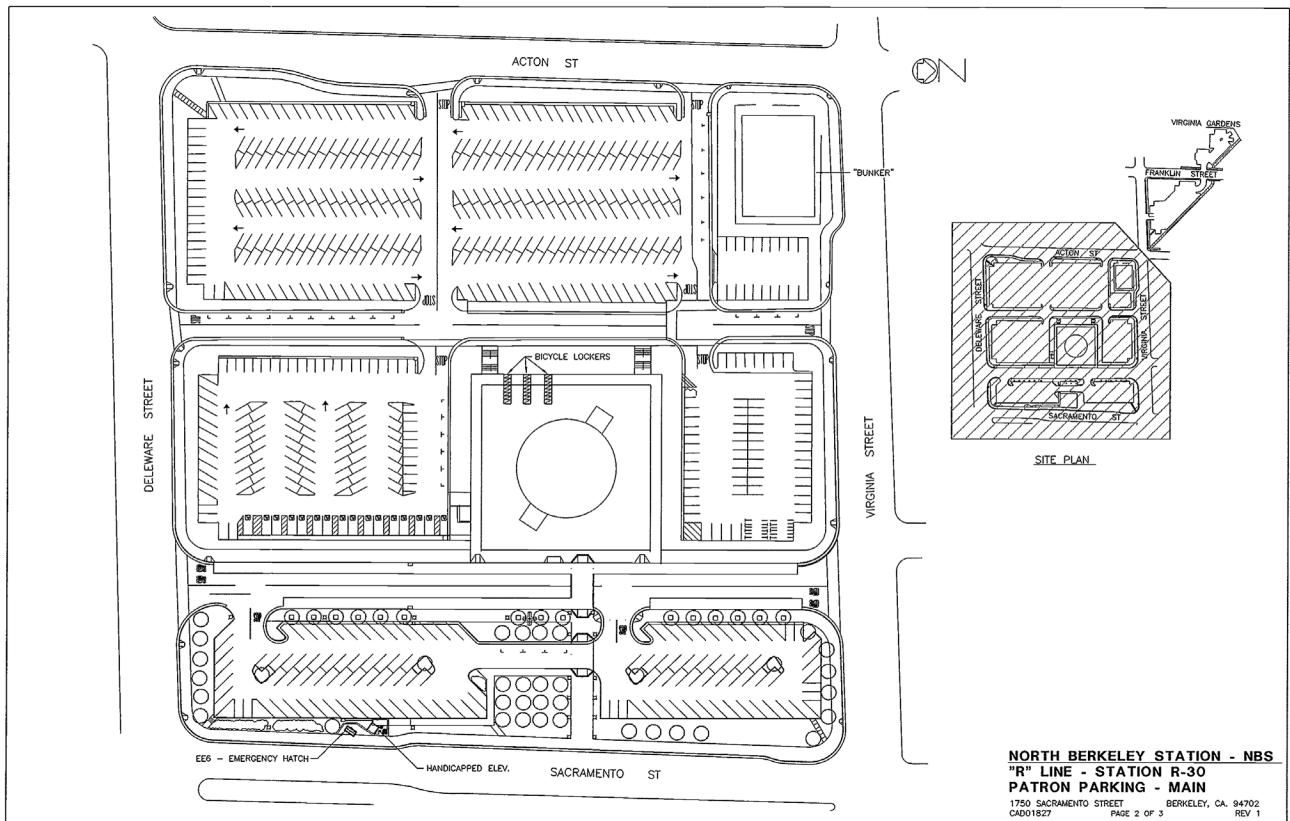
Schematic Plan View of the North Berkeley BART Property prior to implementation of access project that is currently under construction (see Section II.D.2.b.i, below)
